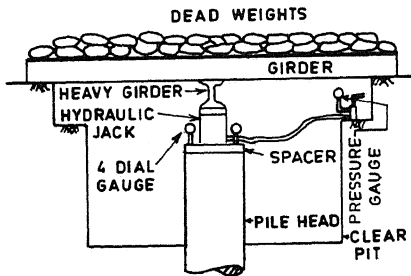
PILE LOAD TEST ARRANGEMENT
